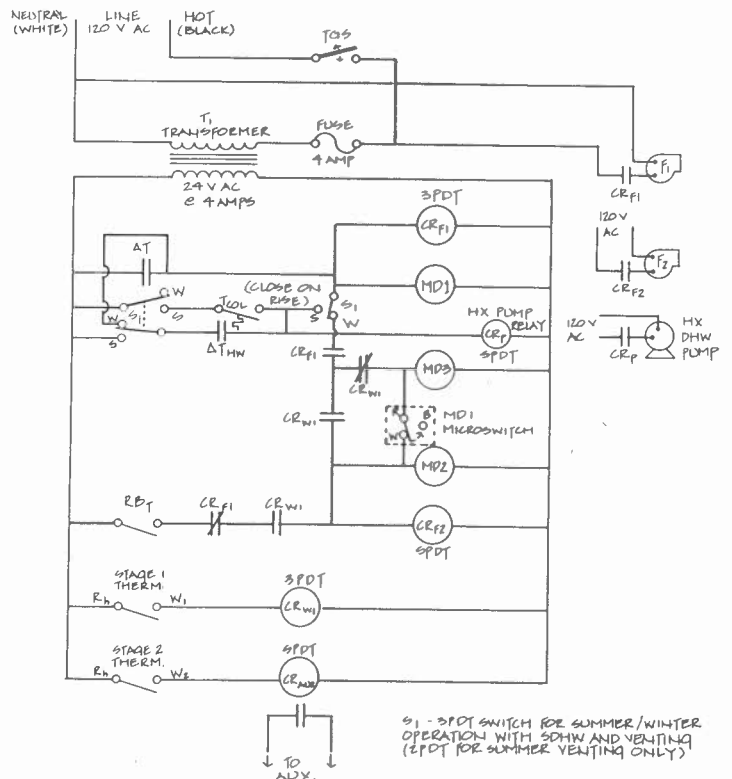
Retrofit Wiring Schematic: Parallel Auxiliary Roof Collector With Storage and Power Venting
